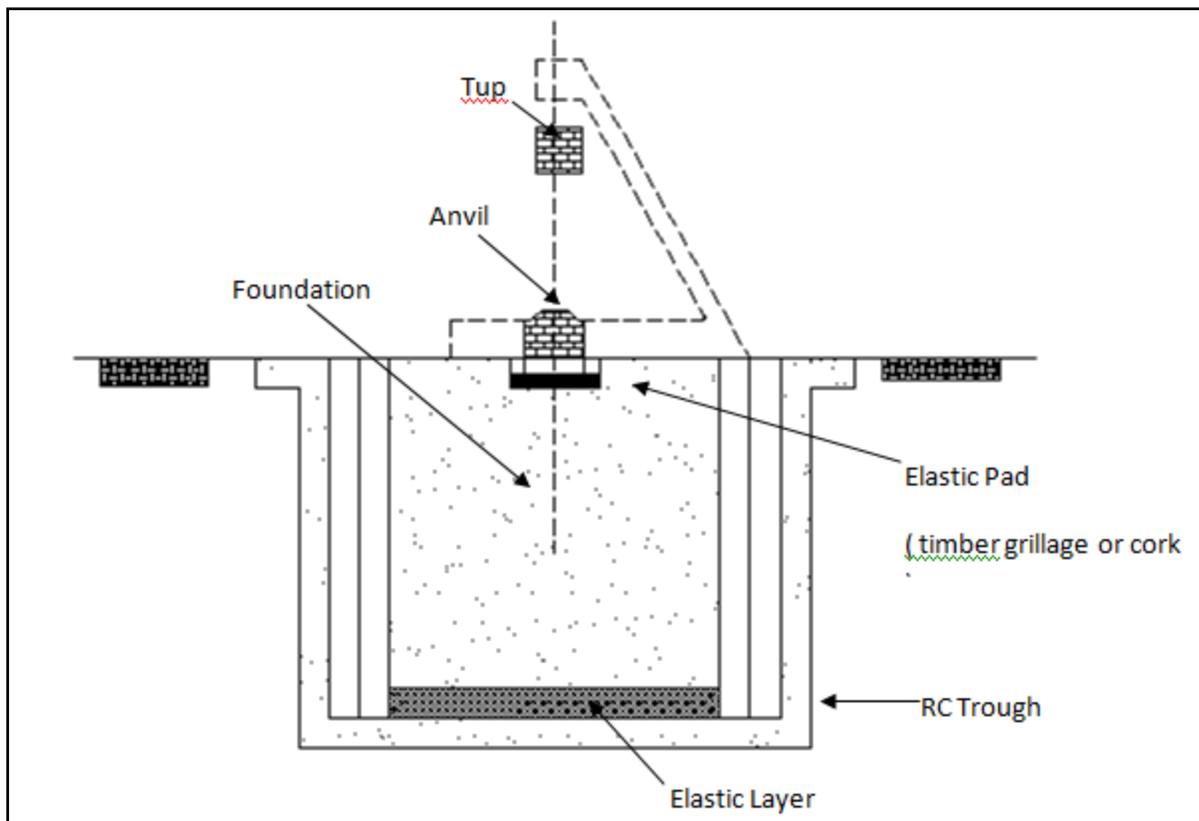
Schematic of a typical hammer foundation (IS 2974-1980)
